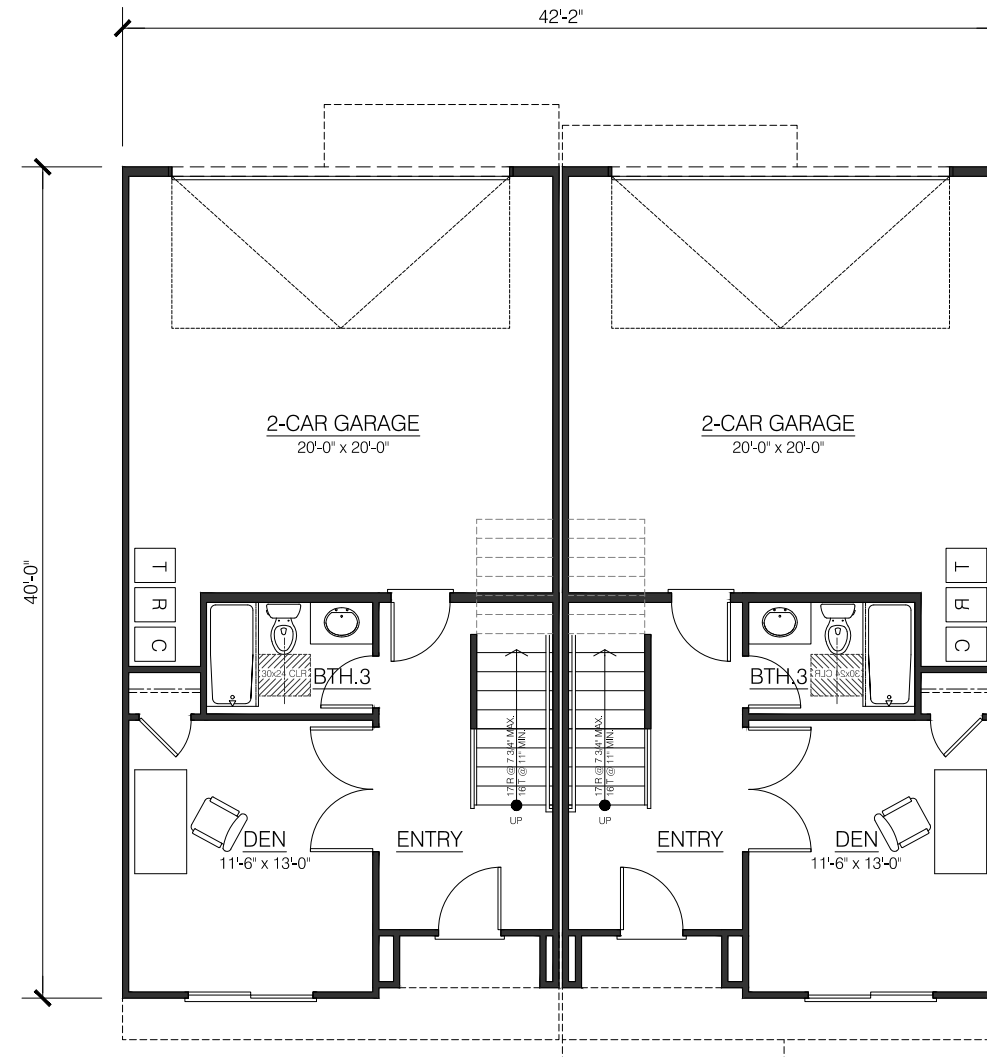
PLAN 1.2 GROUND AND MAIN FLOOR
